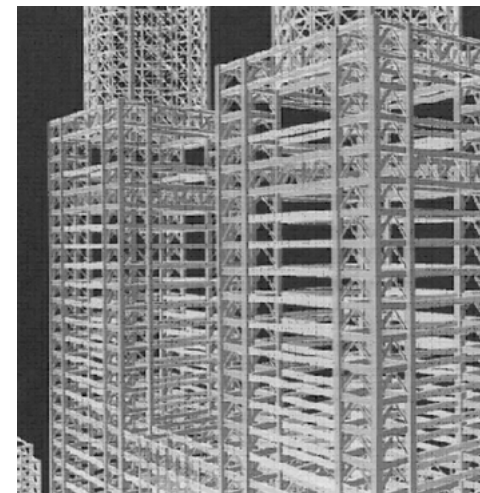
The structure of Tokyo Metropolitan Main Building (Source: Muto Associates)
